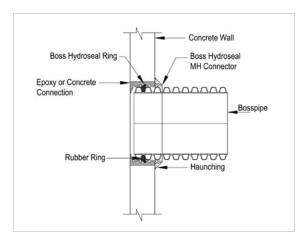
Manhole Connection with a manhole connector Where a flexible joint is required to provide for movement. Suitable for manholes, concrete walls, etc.
